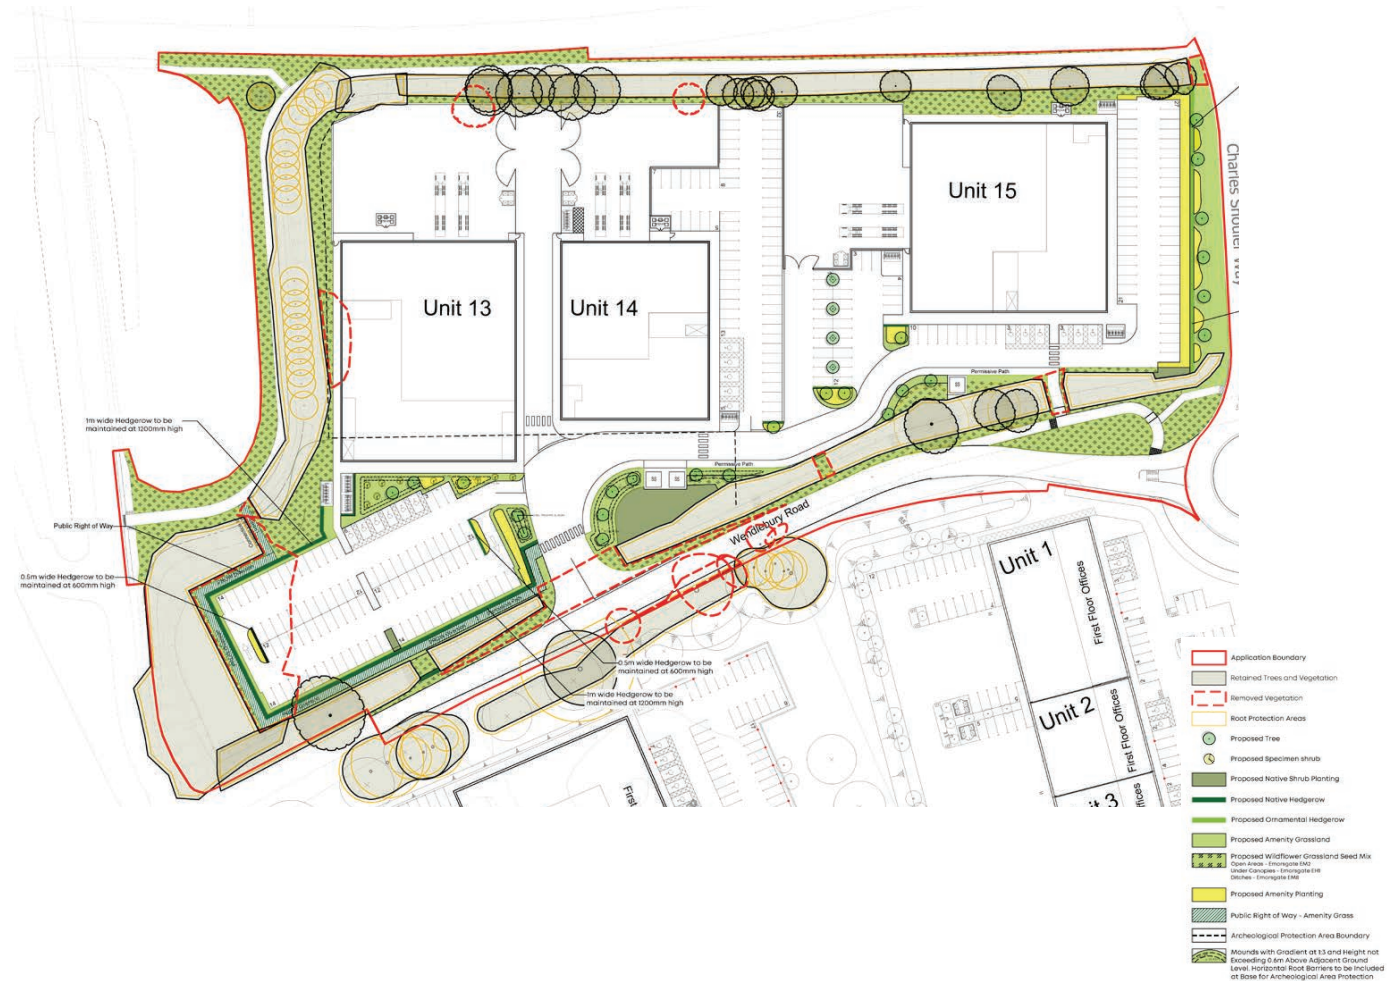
LAIRD BAILEY DETAILED SOFT LANDSCAPE PROPOSAL - NOT TO SCALE
